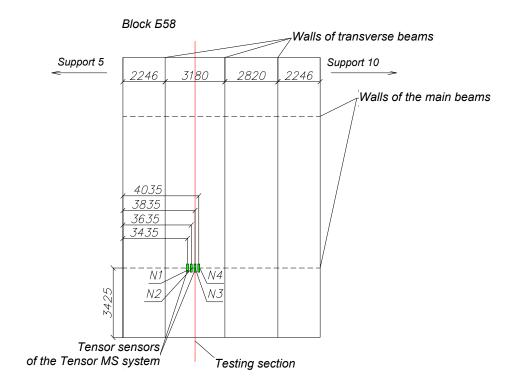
Example of placing the test load and measurement equipment in the roadway: scheme of placing the measurement equipment in the plan (the bridge through the Tobol River)
